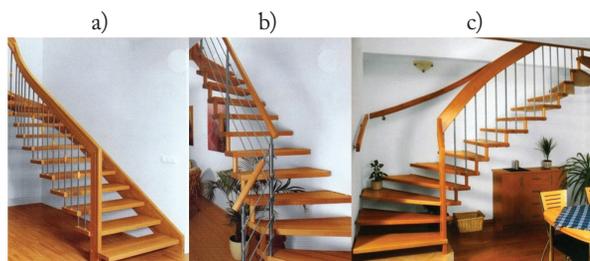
Wooden prefabricated staircase with one-sided suspended stairs with a wall string a) and without wall string b), c). Source from (JEMA Svitavy 2006).
